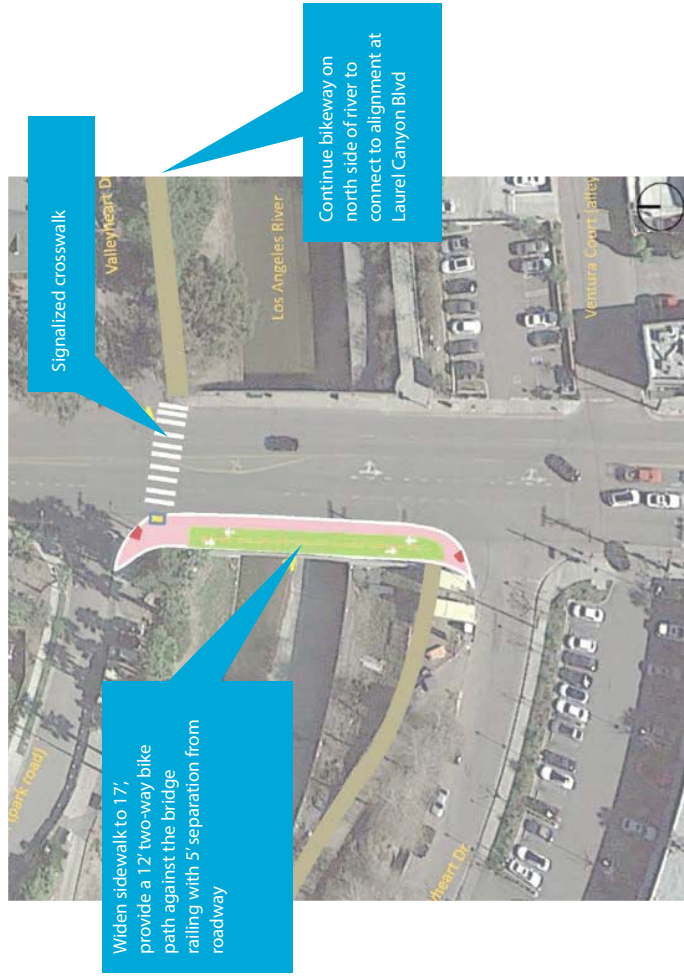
At-Grade Concept Plan for Whitsett Ave
